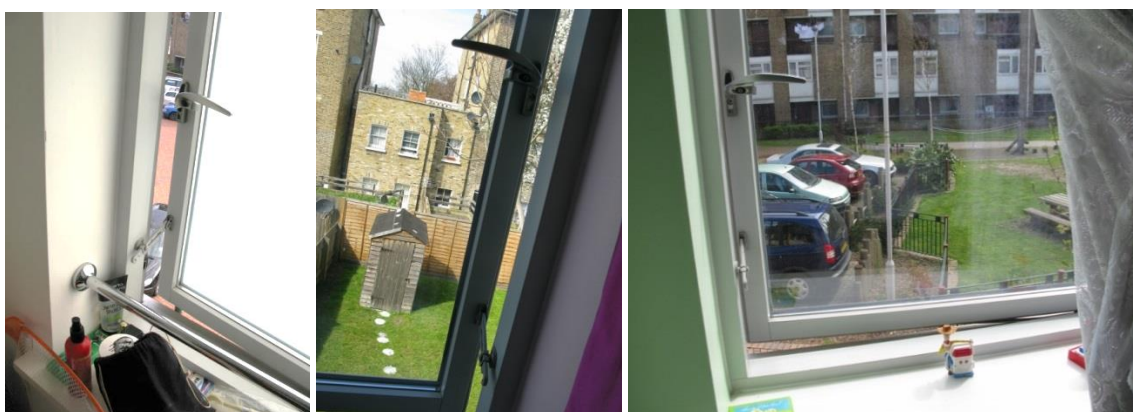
Windows open in bathroom (left), back bedroom (centre) and second floor hallway (right) (C1)
